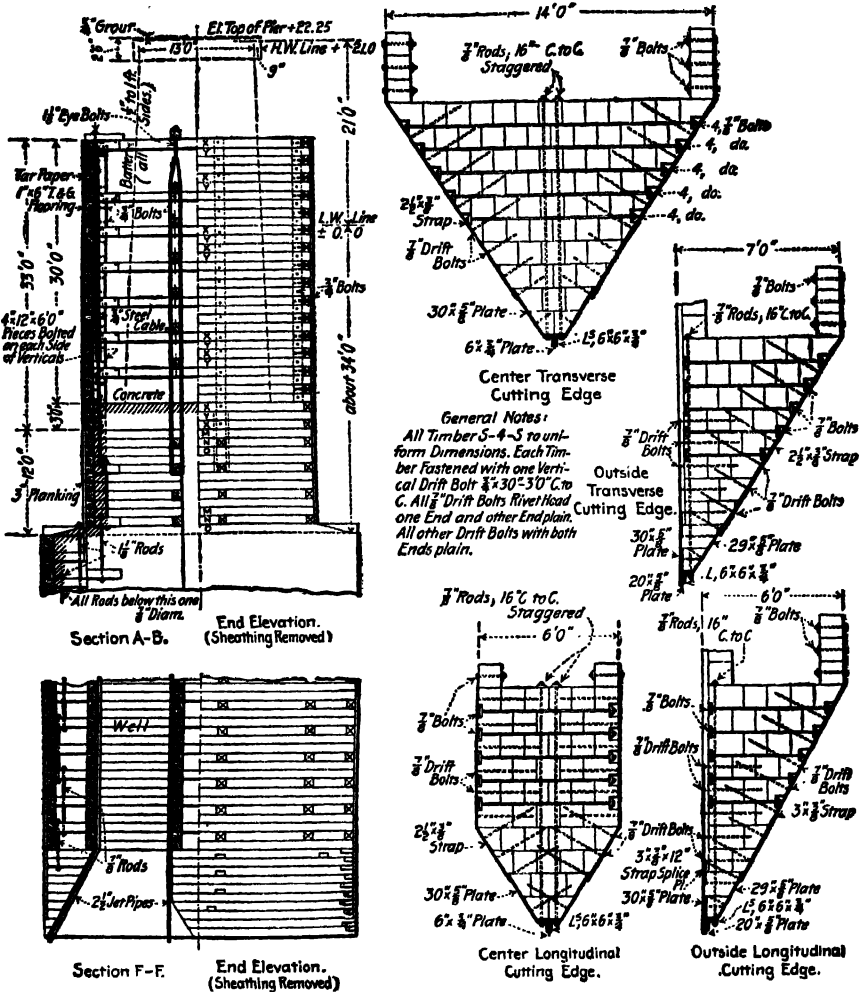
Open-dredging Caisson and Cofferdam for the O.-W. R. R. & N. Co.'s Bridge over the Willamette River at Portland, Ore.
